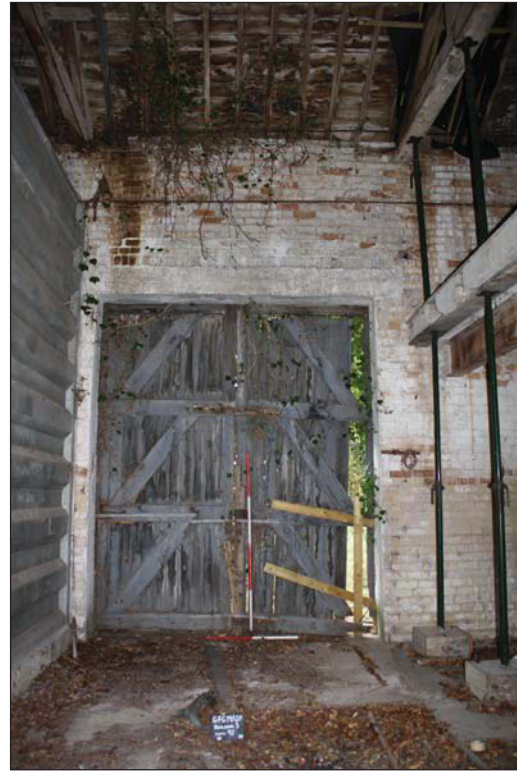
Door detail, looking W, Scales: 1x1m, 1x2m.
